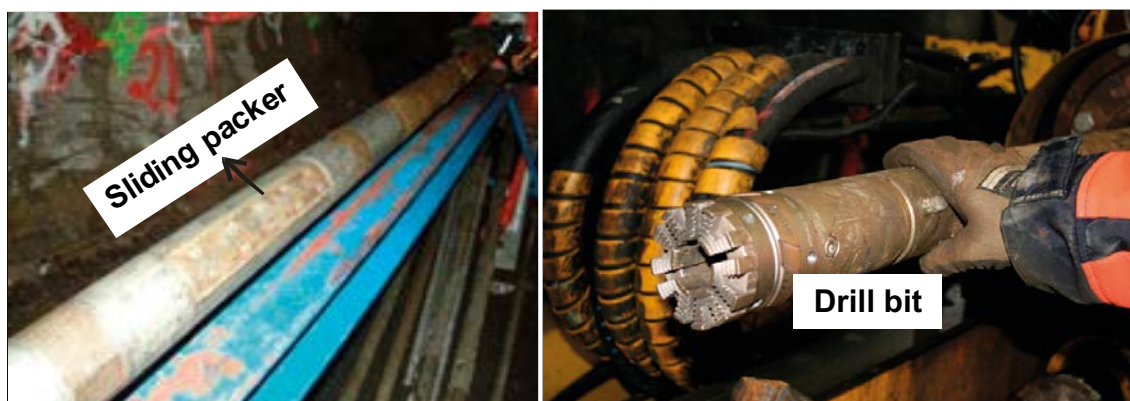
DeviDrill core barrel. Left: When water pressure increases (to about 20 bars), the sliding packer expands and locks the barrel in its position. Right: The end of the DeviDrill. The drill bit gives a 31.5 mm core in sections where steering is applied.
